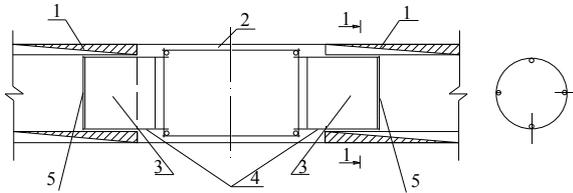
Improved connection of circular hollow-core slabs with a monolithic girder in a precast-cast-in-place floor: 1 – slab supporting sections; 2 – monolithic girder; 3 – keys; 4 – cylindrical reinforcement cages; 5 – key size limiter
